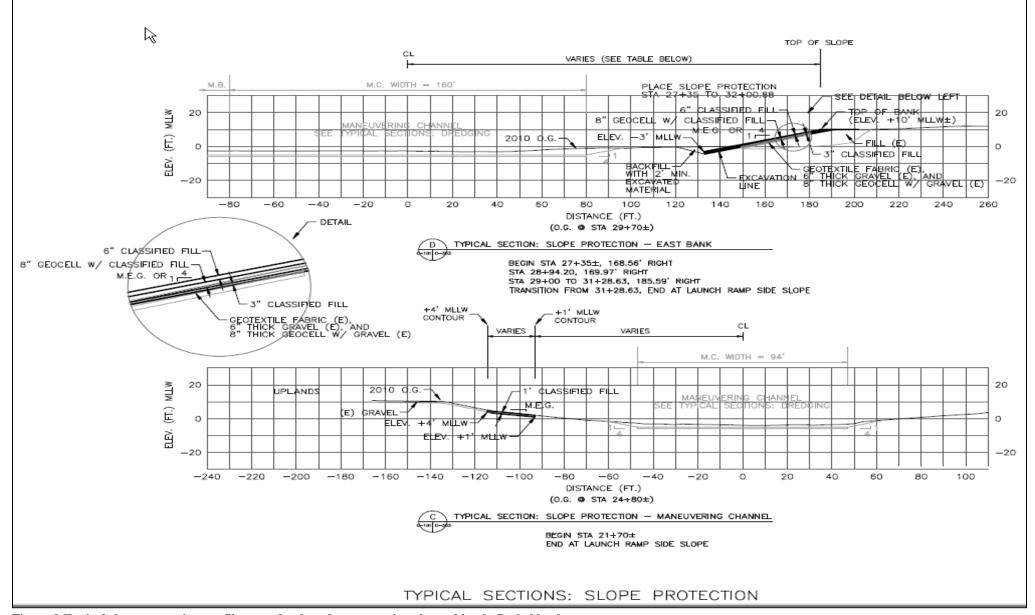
Typical slope protection profiles, east bank and maneuvering channel bank, Bethel harbor.
